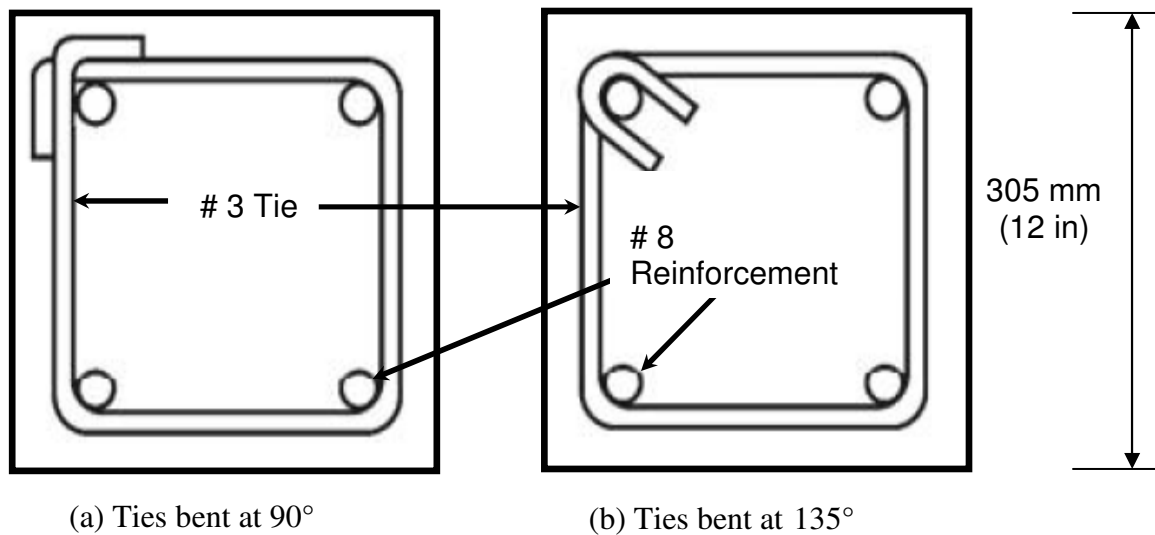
Typical layout of ties used in RC columns [Kodur, 2003].
